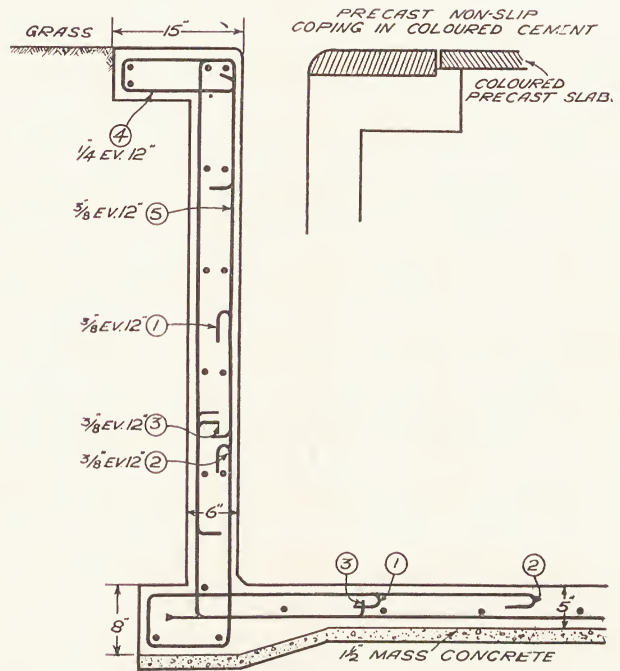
DESIGN FOR WALLS AND FLOOR, ASSUMING DEPTH DOES NOT EXCEED 4 FT. 9 IN.
